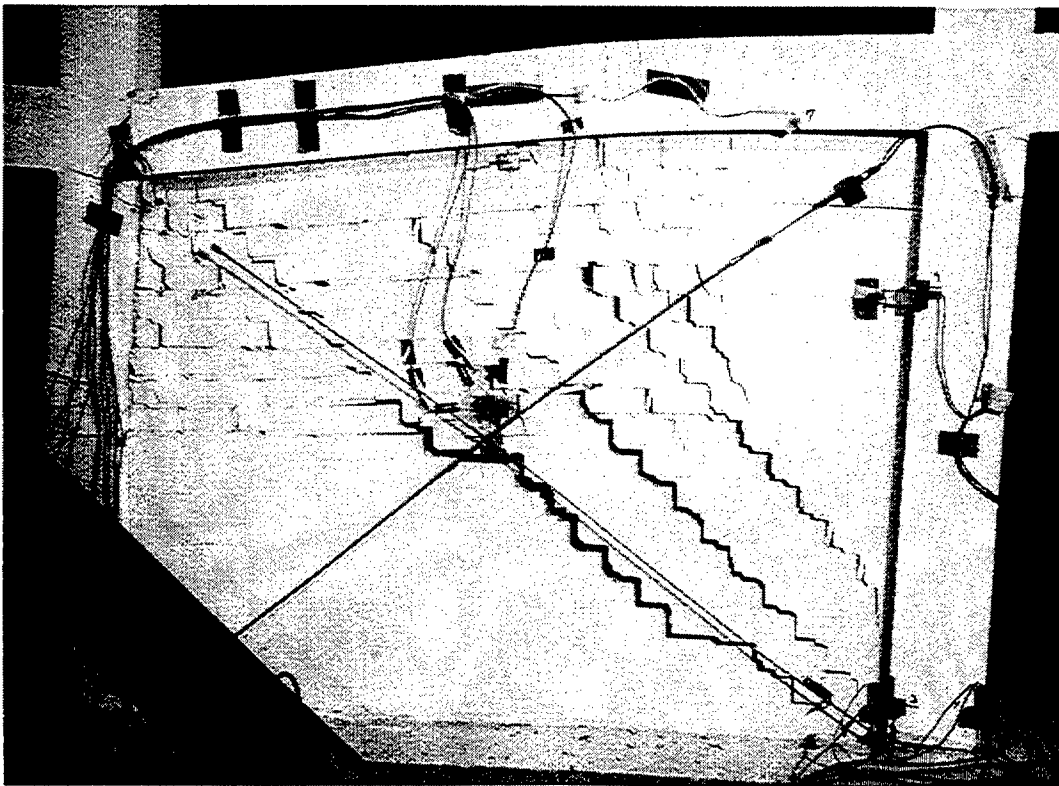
Model 3, Single-Bay Brick-Infilled Specimen, Formation of Two Diagonal Struts
